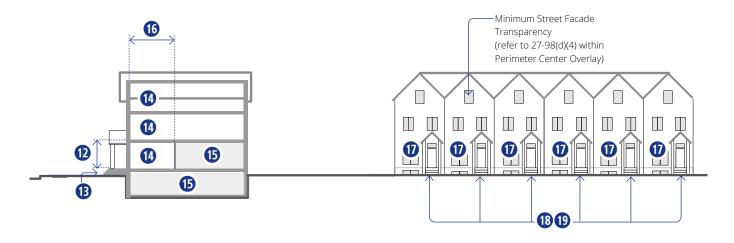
Townhouse Building: Floor-to-Floor Height & Use Requirements
